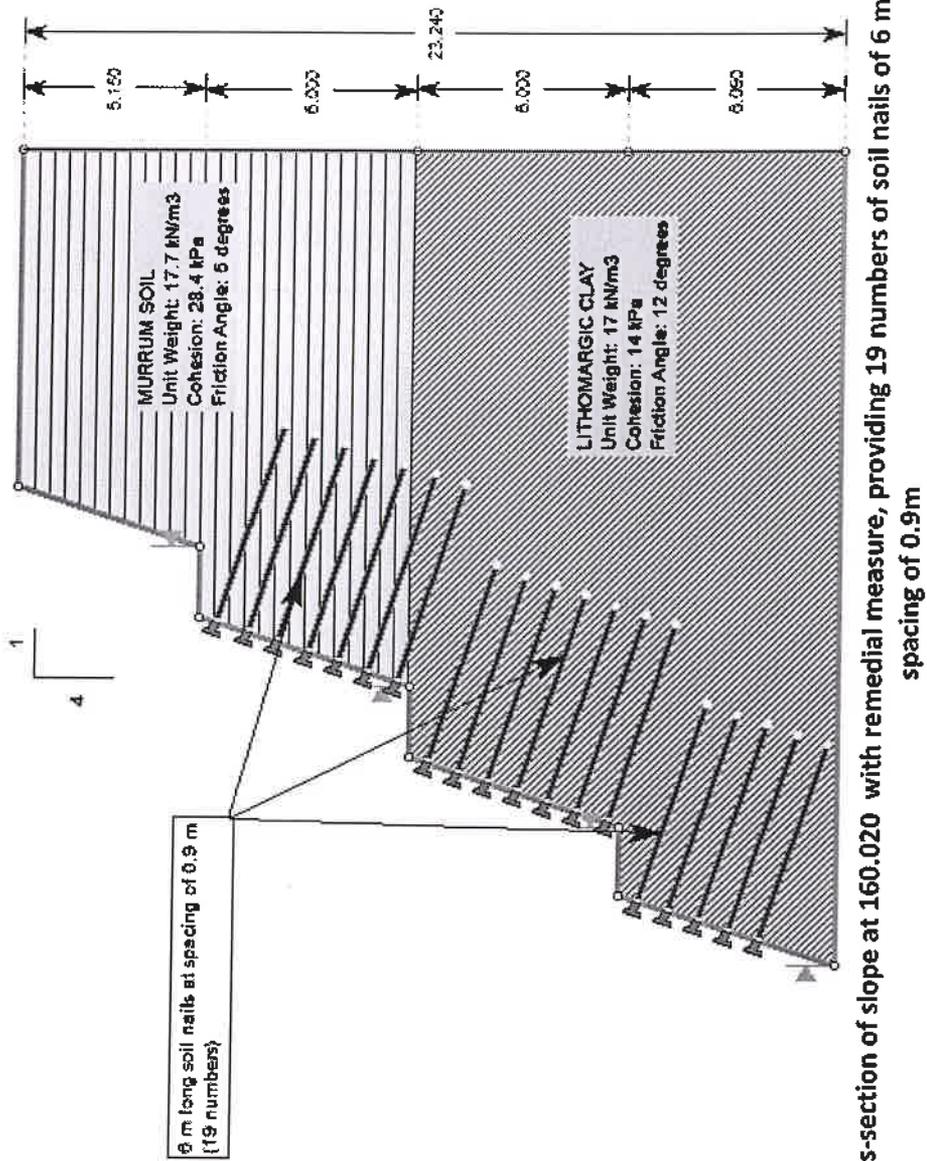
Cross-section of slope at 160.020 with remedial measure, providing 19 numbers of soil nails of 6 m length at spacing of 0.9m
